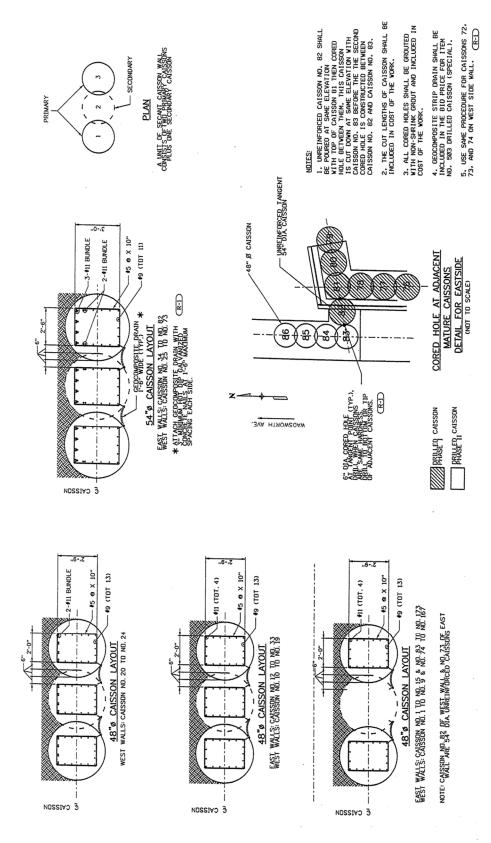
Secant Caisson Wall Details Example
